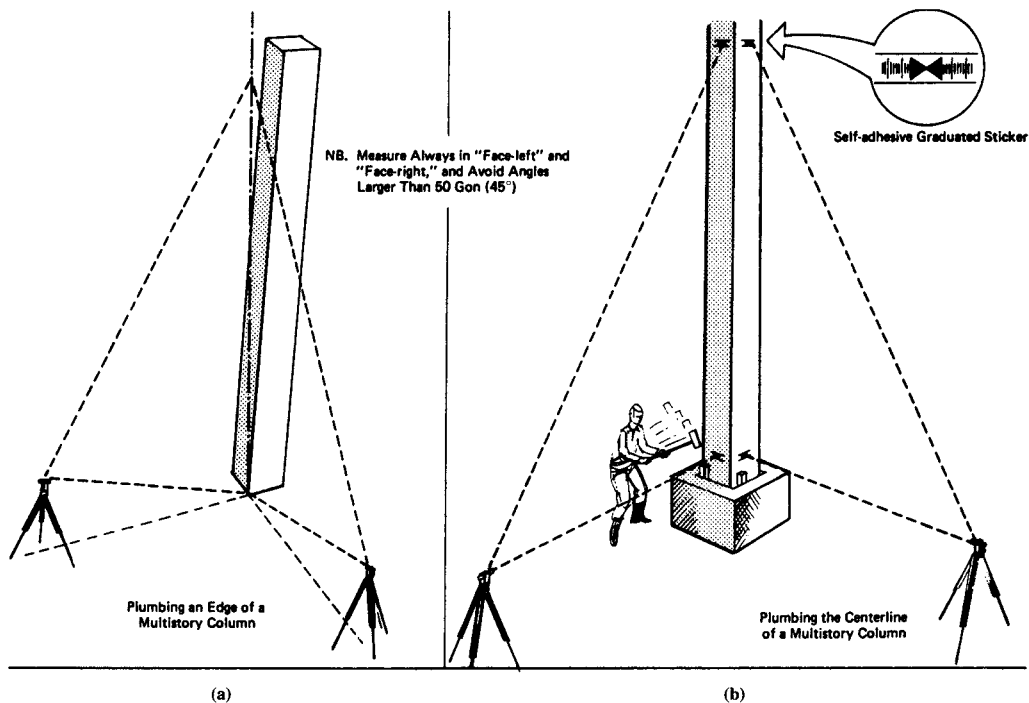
Plumbing multistory steel columns. (a) Plumbing column edge; (b) plumbing pretargeted column centerlines. (Courtesy of the National Swedish Institute for Building Research, FIG Report 69)
